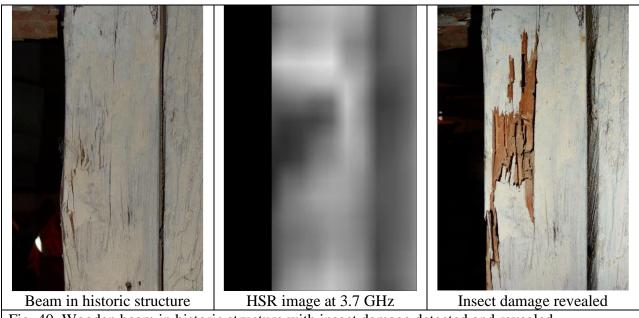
Wooden beam in historic structure with insect damage detected and revealed.
